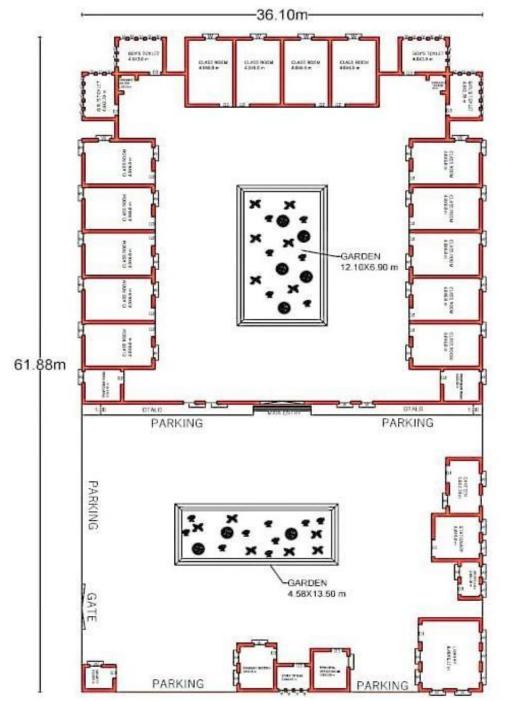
DESIGN LAYOUT OF SCHOOL BUILDING
